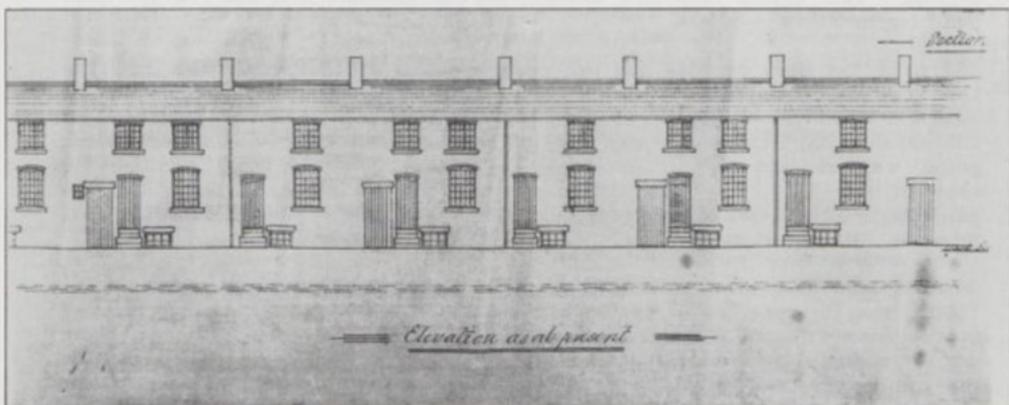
Building plan No.4982, 1881, Primrose Hill (note: row of ten)
